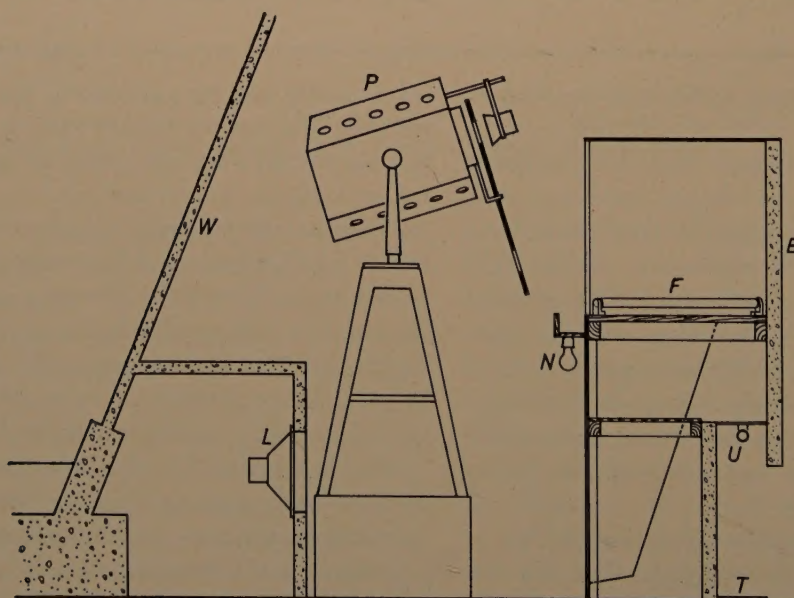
Vertical section through the space behind the balustrade. *W* concrete wall of pavilion. *L* low-note loudspeaker in one wall of closed concrete cabinet. *P* projection lantern. *F* white and coloured fluorescent lamps. *N* lamp for emergency lighting. *U* tubular ultra-violet lamp for exciting floor-tiles *T* into fluorescence. *B* balustrade.
